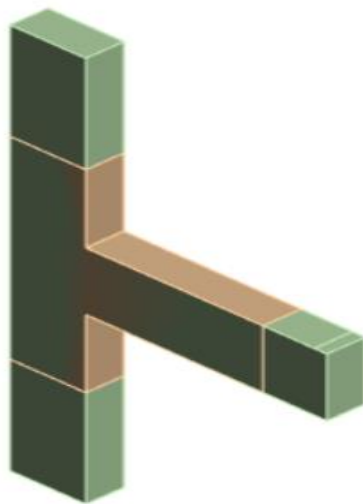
Model of exterior beam column joint retrofitted with FRP
